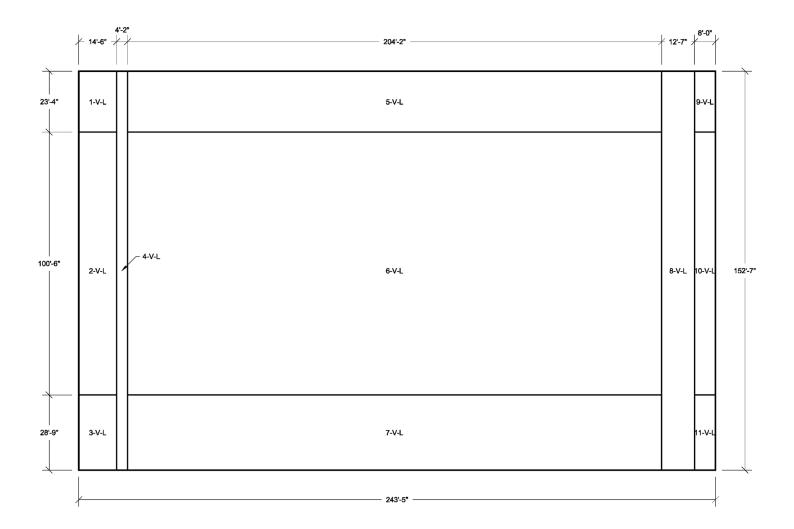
H.3-31 Basemat Looking Down North-South Reinforcement Zones Far Side Face
